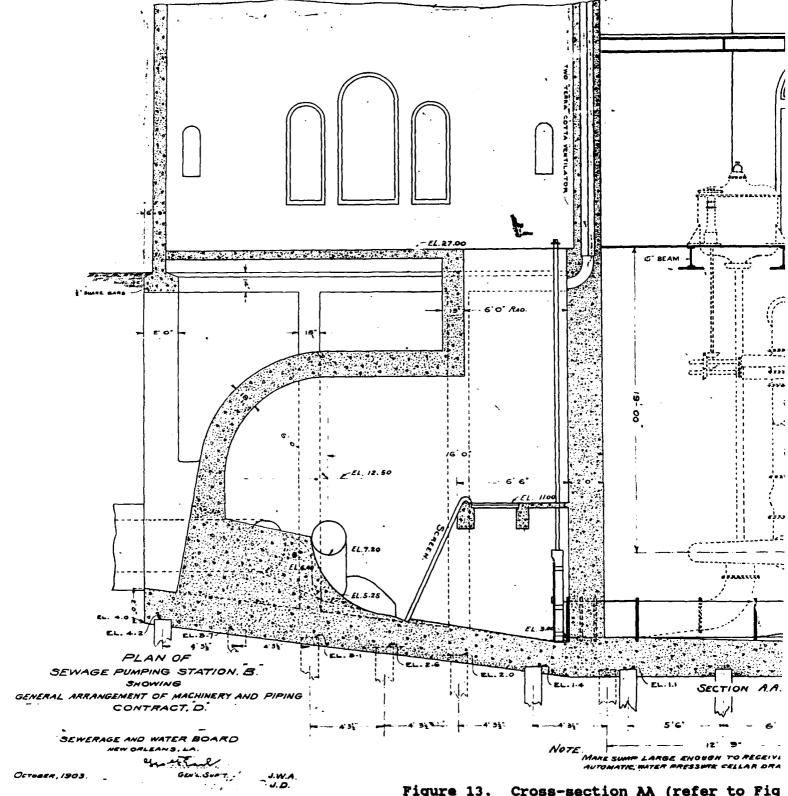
Cross-section AA (refer to Fig plans for machinery and piping in Station Drawing No. 976-A-10 dated 1903, Sewerage files).
